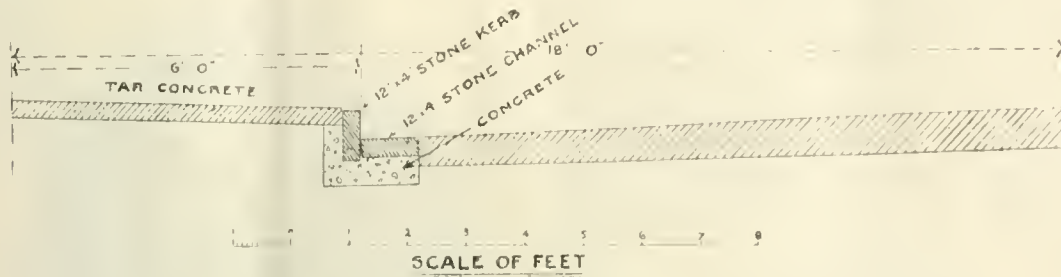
PRIVATE STREET WORKS: HALF-SECTION.
